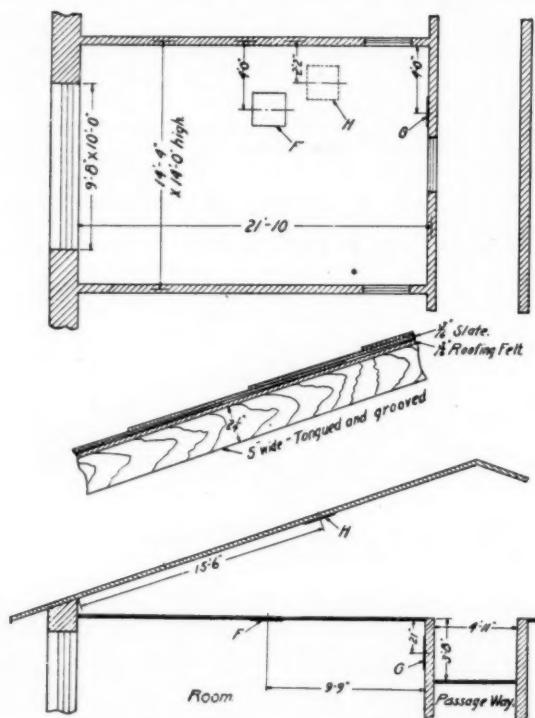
TEST OF CEILING, WALL AND ROOF F, G AND H
